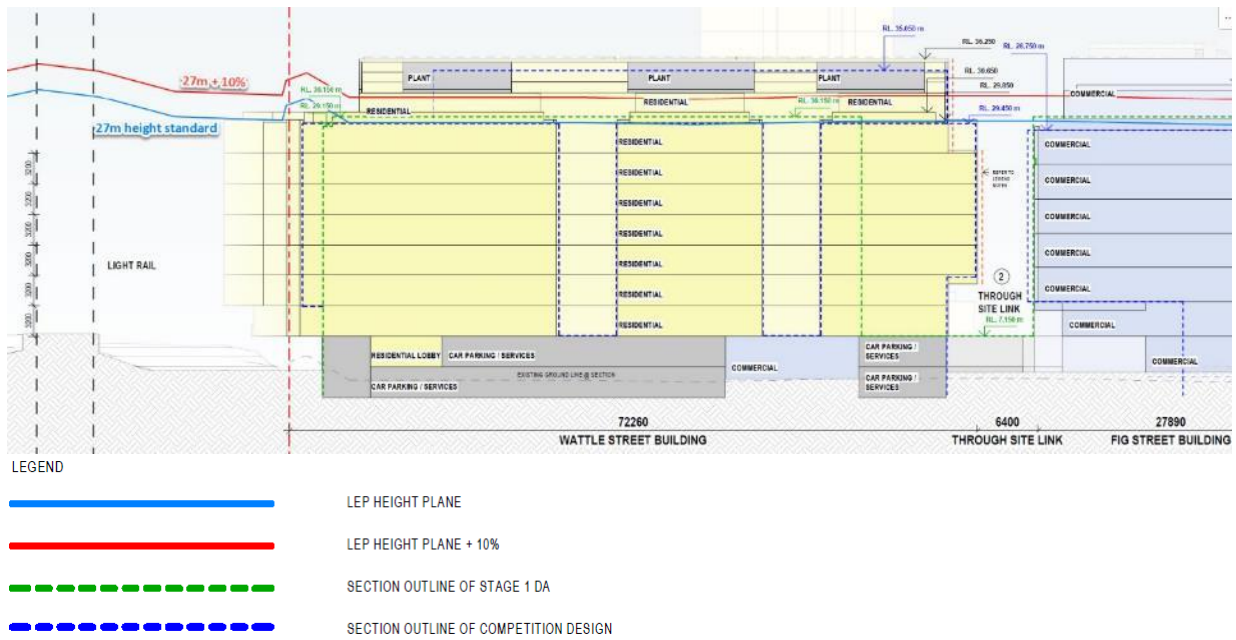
Building C - Wattle Street Section: Proposed/modified building envelope
